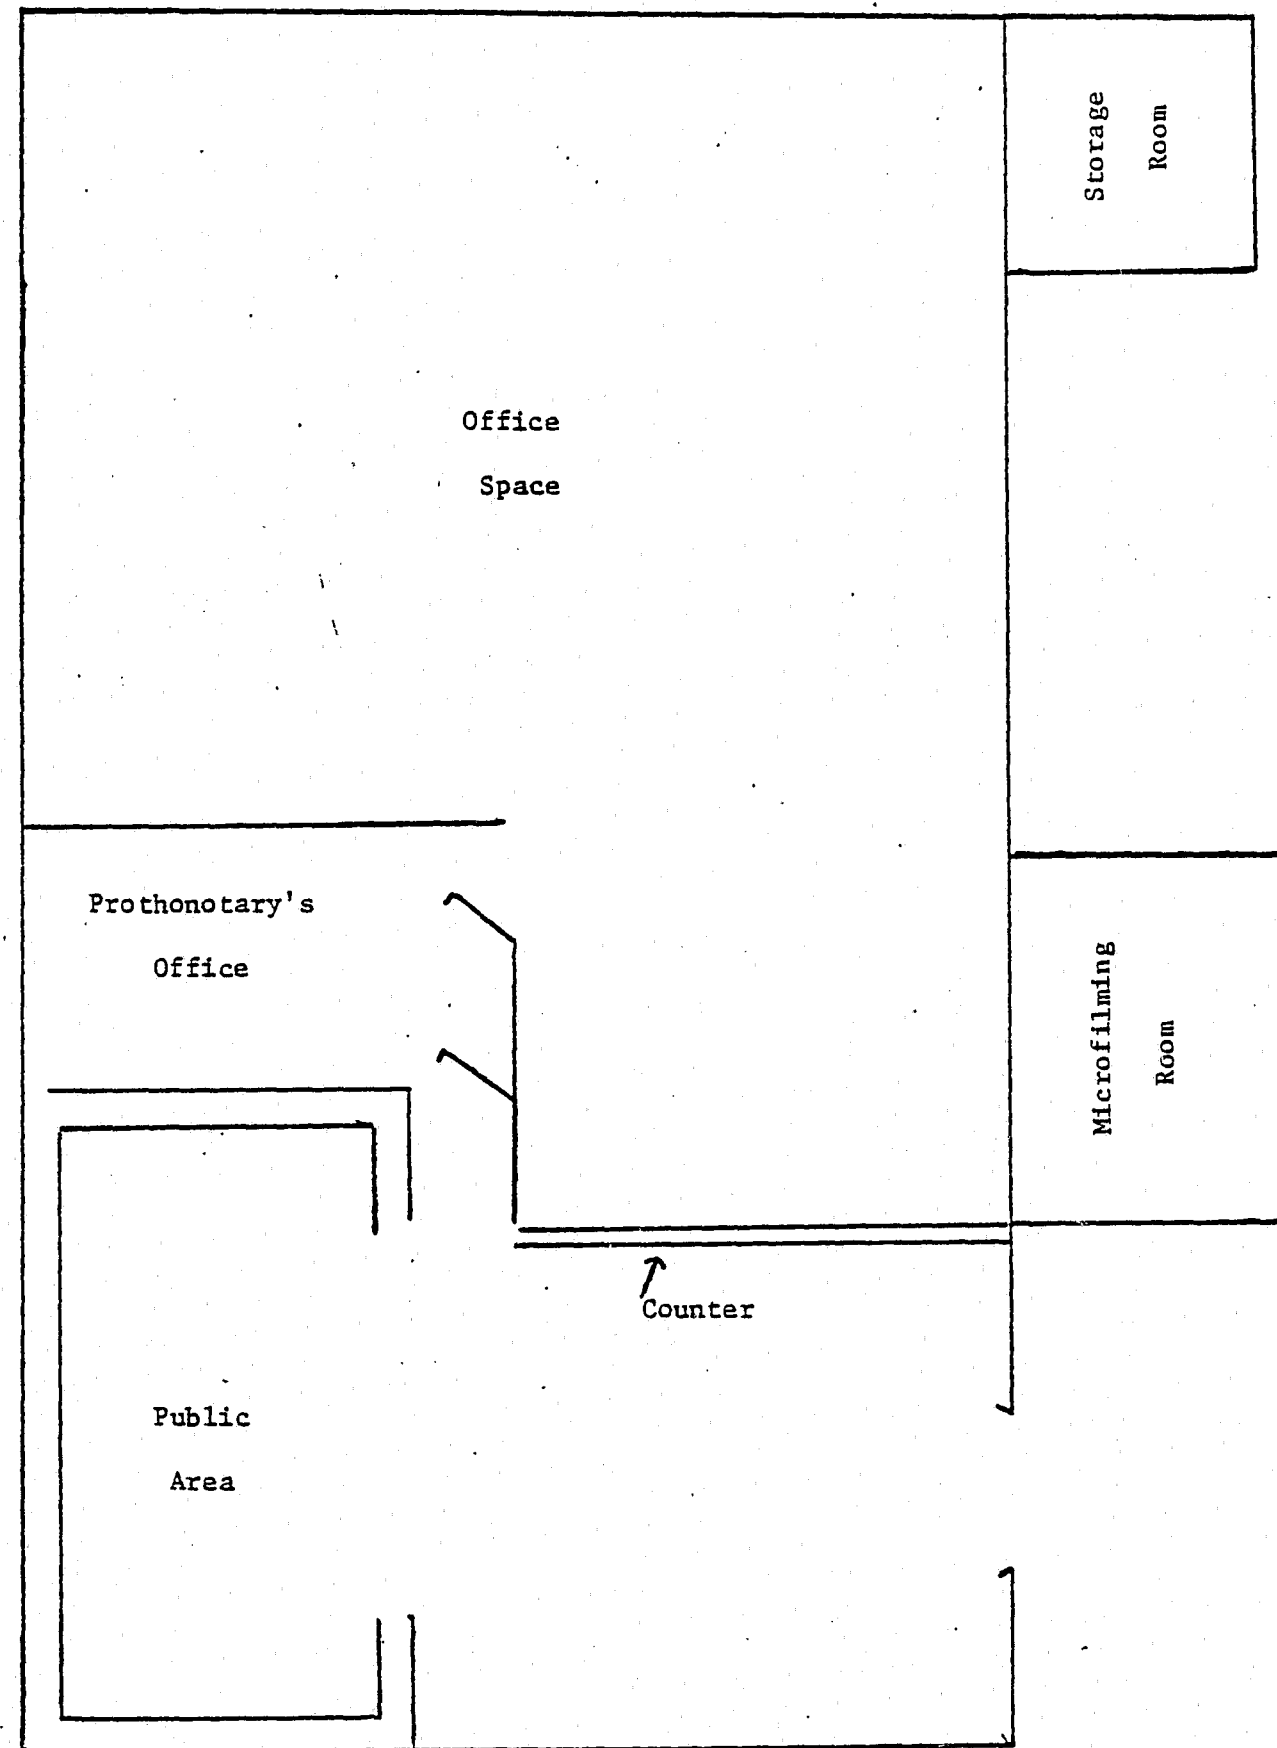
PROTHONOTARY'S OFFICE: FLOOR PLAN FOR ALTERNATIVE TWO
